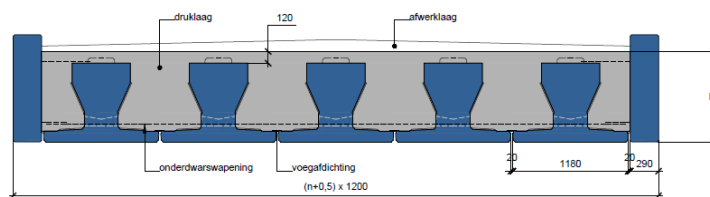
Cross section of prefab deck using infill beams – Spanbeton
